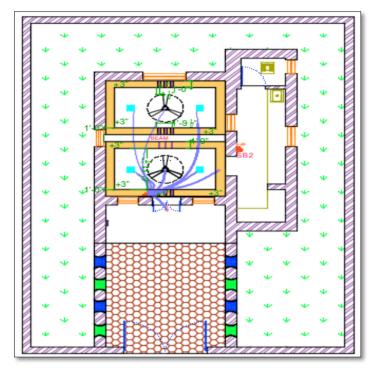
Proposed False Ceiling Design and Electrical Layout of Design Project-I Project-I Nandghar Ujeti
